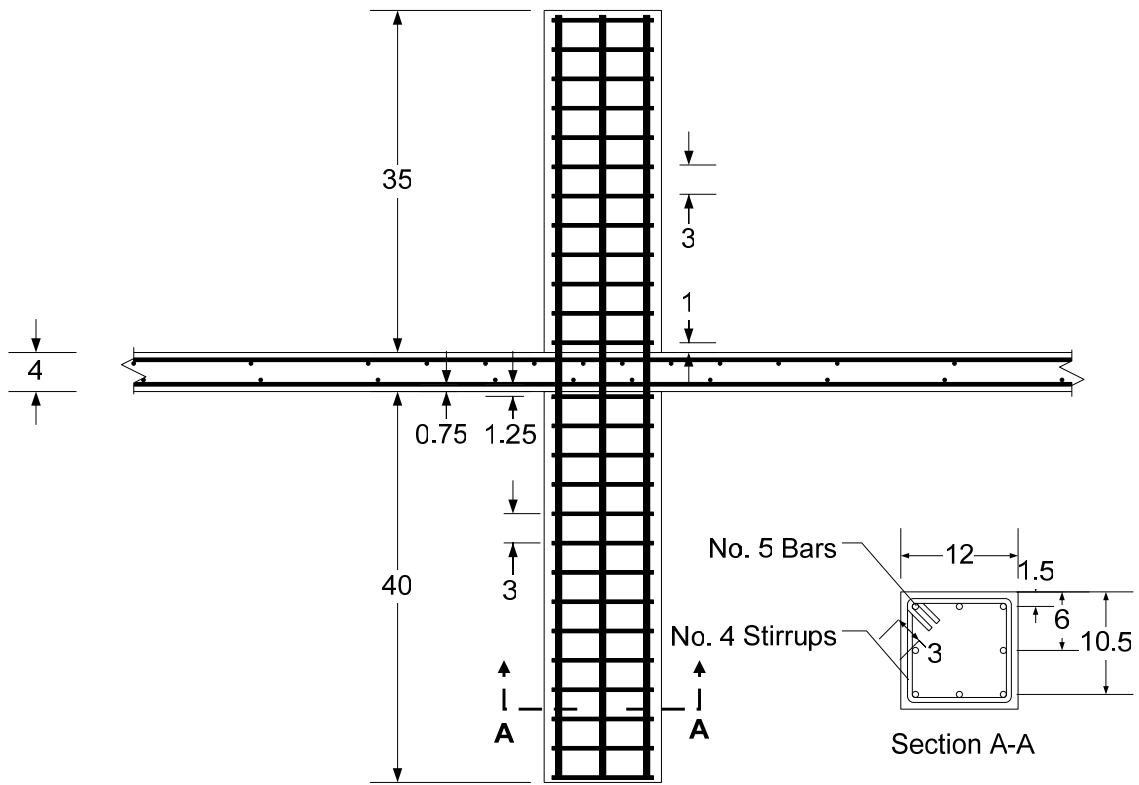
Test Setup for Specimens SU1 and SU2
